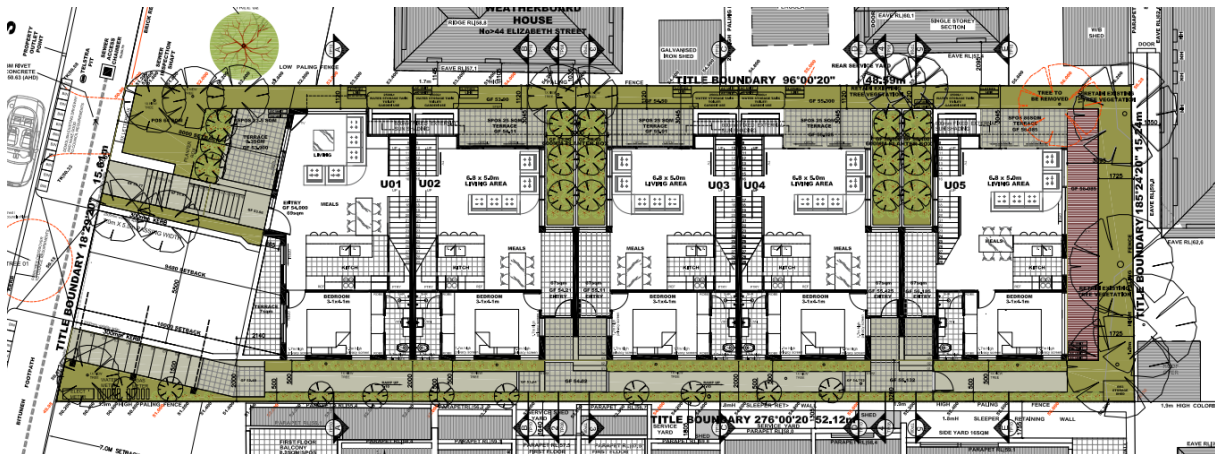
Proposed ground floor plan which includes additional landscaping (when compared to the previously submitted landscape plan found in Figure 16).
